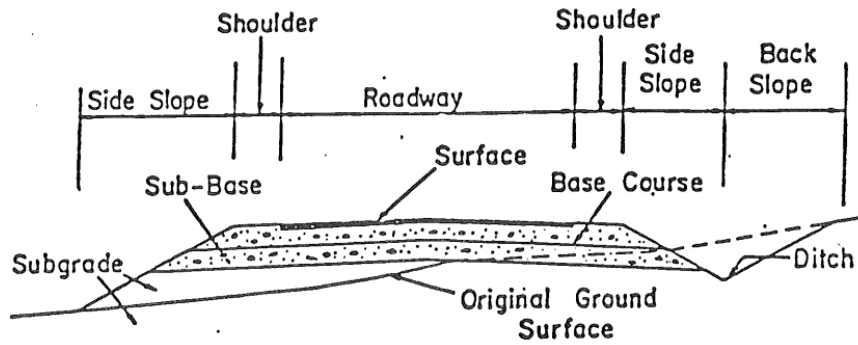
Typical road cross-section of previous rotation forest roads (Farley, 1985).
